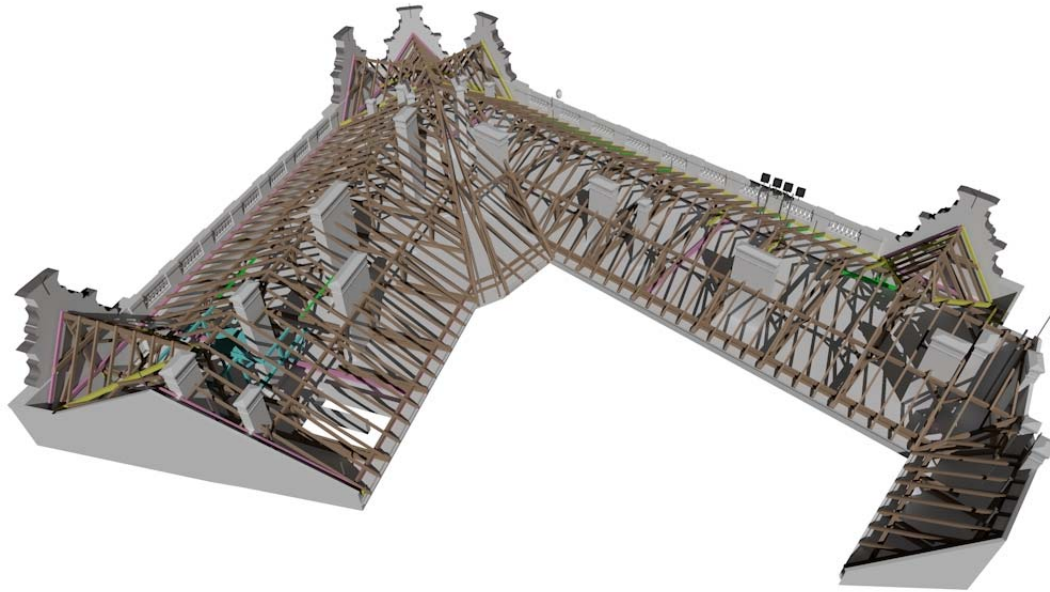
As-built state - 3D modelled truss (more than 750 timber pieces)
